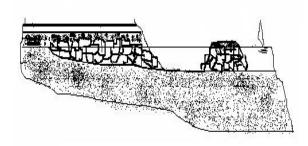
Coastline filling in shallow water by mixed excavation containing soil
